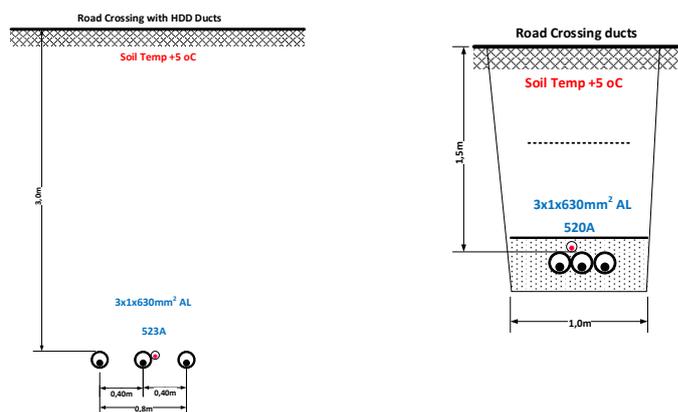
220kV cable – onshore HDD and road crossing arrangement
